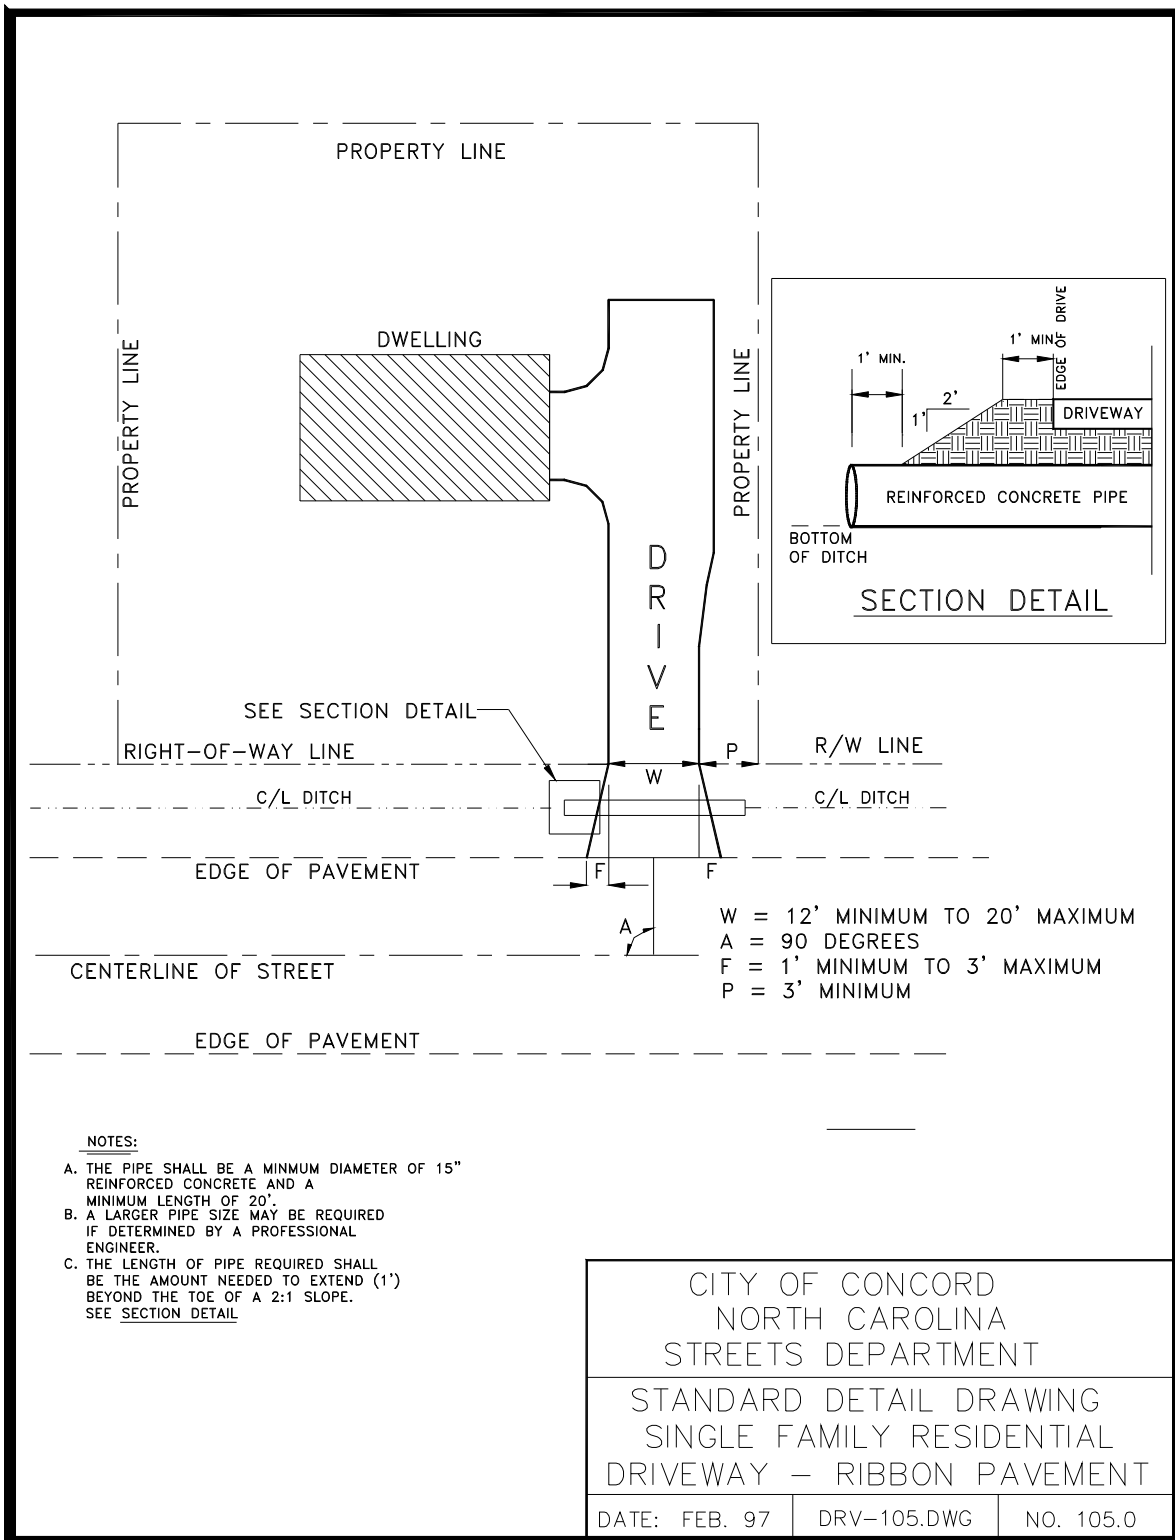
Single-Family Residential Driveway with Ribbon Pavement Street.
